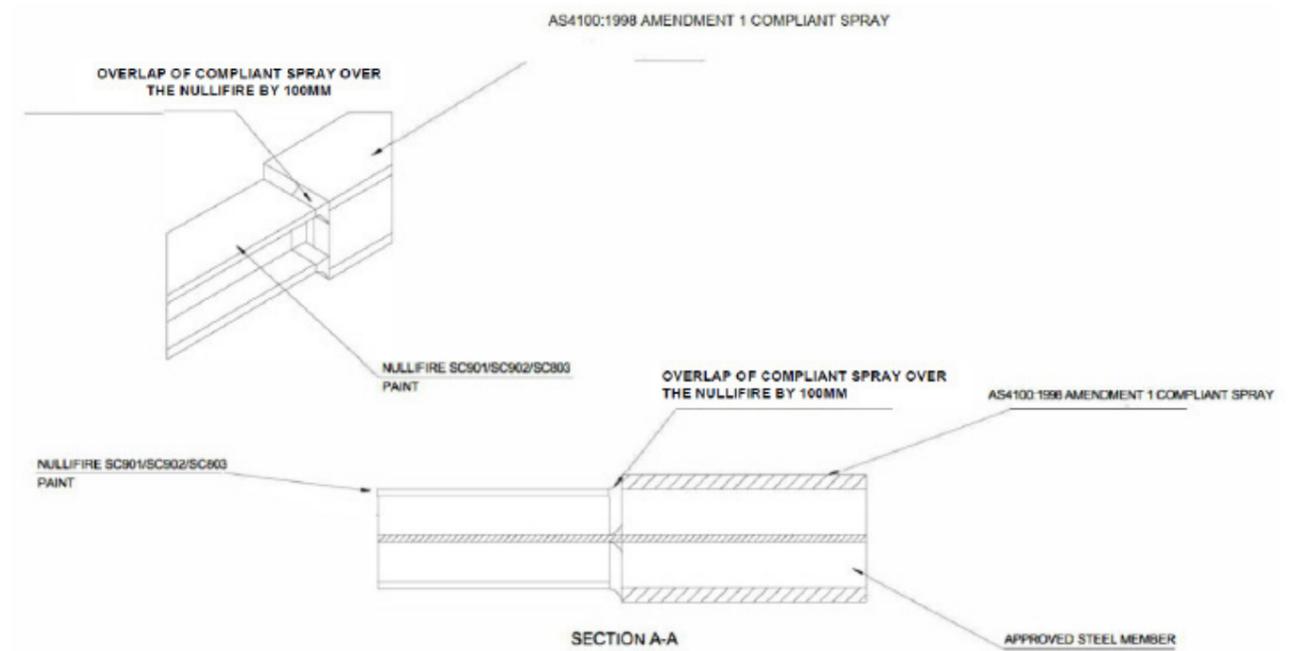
The construction detail when the spray protection system is added next to the Nullfire intumescent coating
